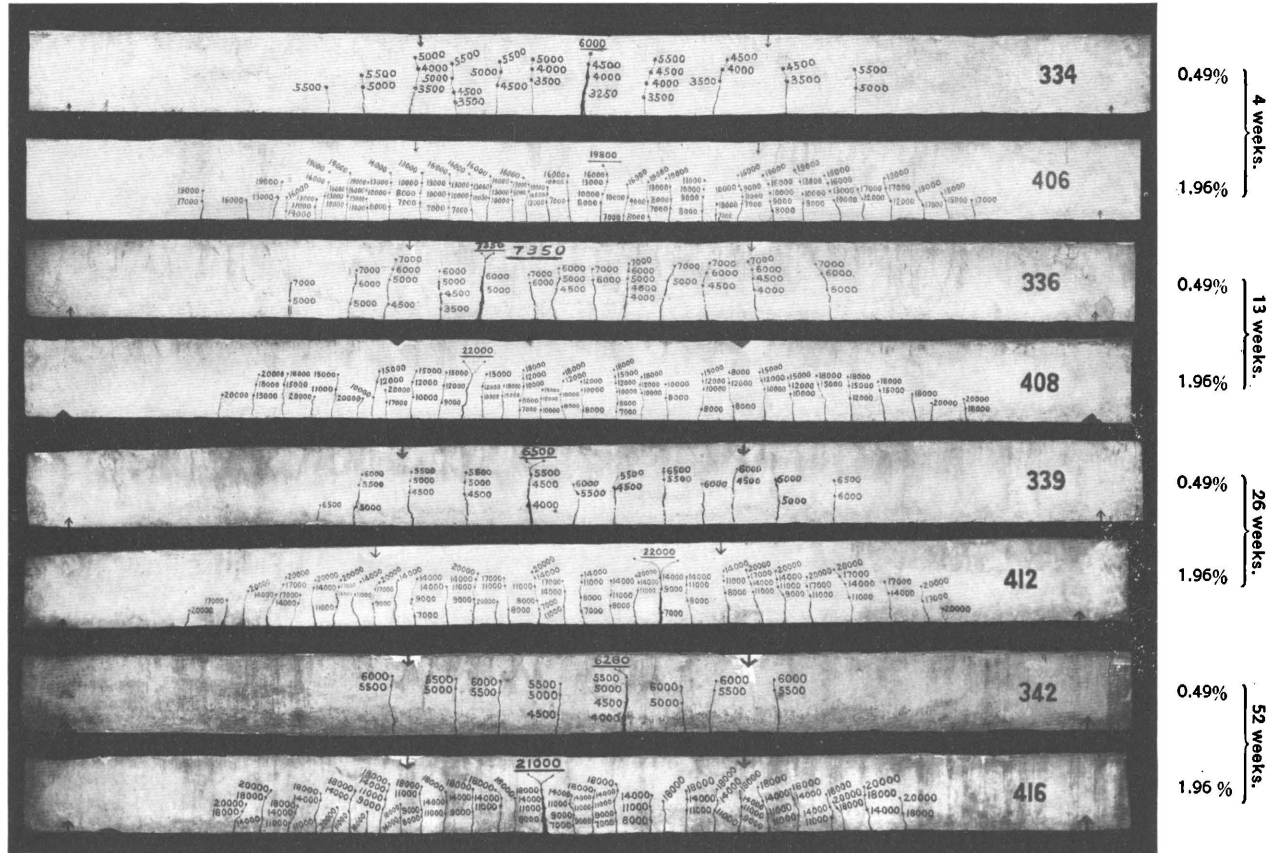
Gravel Concrete, Showing Beams with 0.49 and 1.96 Percentages Reinforcement
